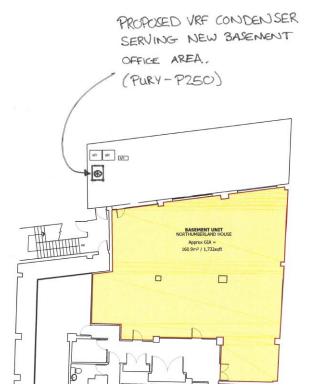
Location of proposed new building services plant in Northumberland House rear courtyard
